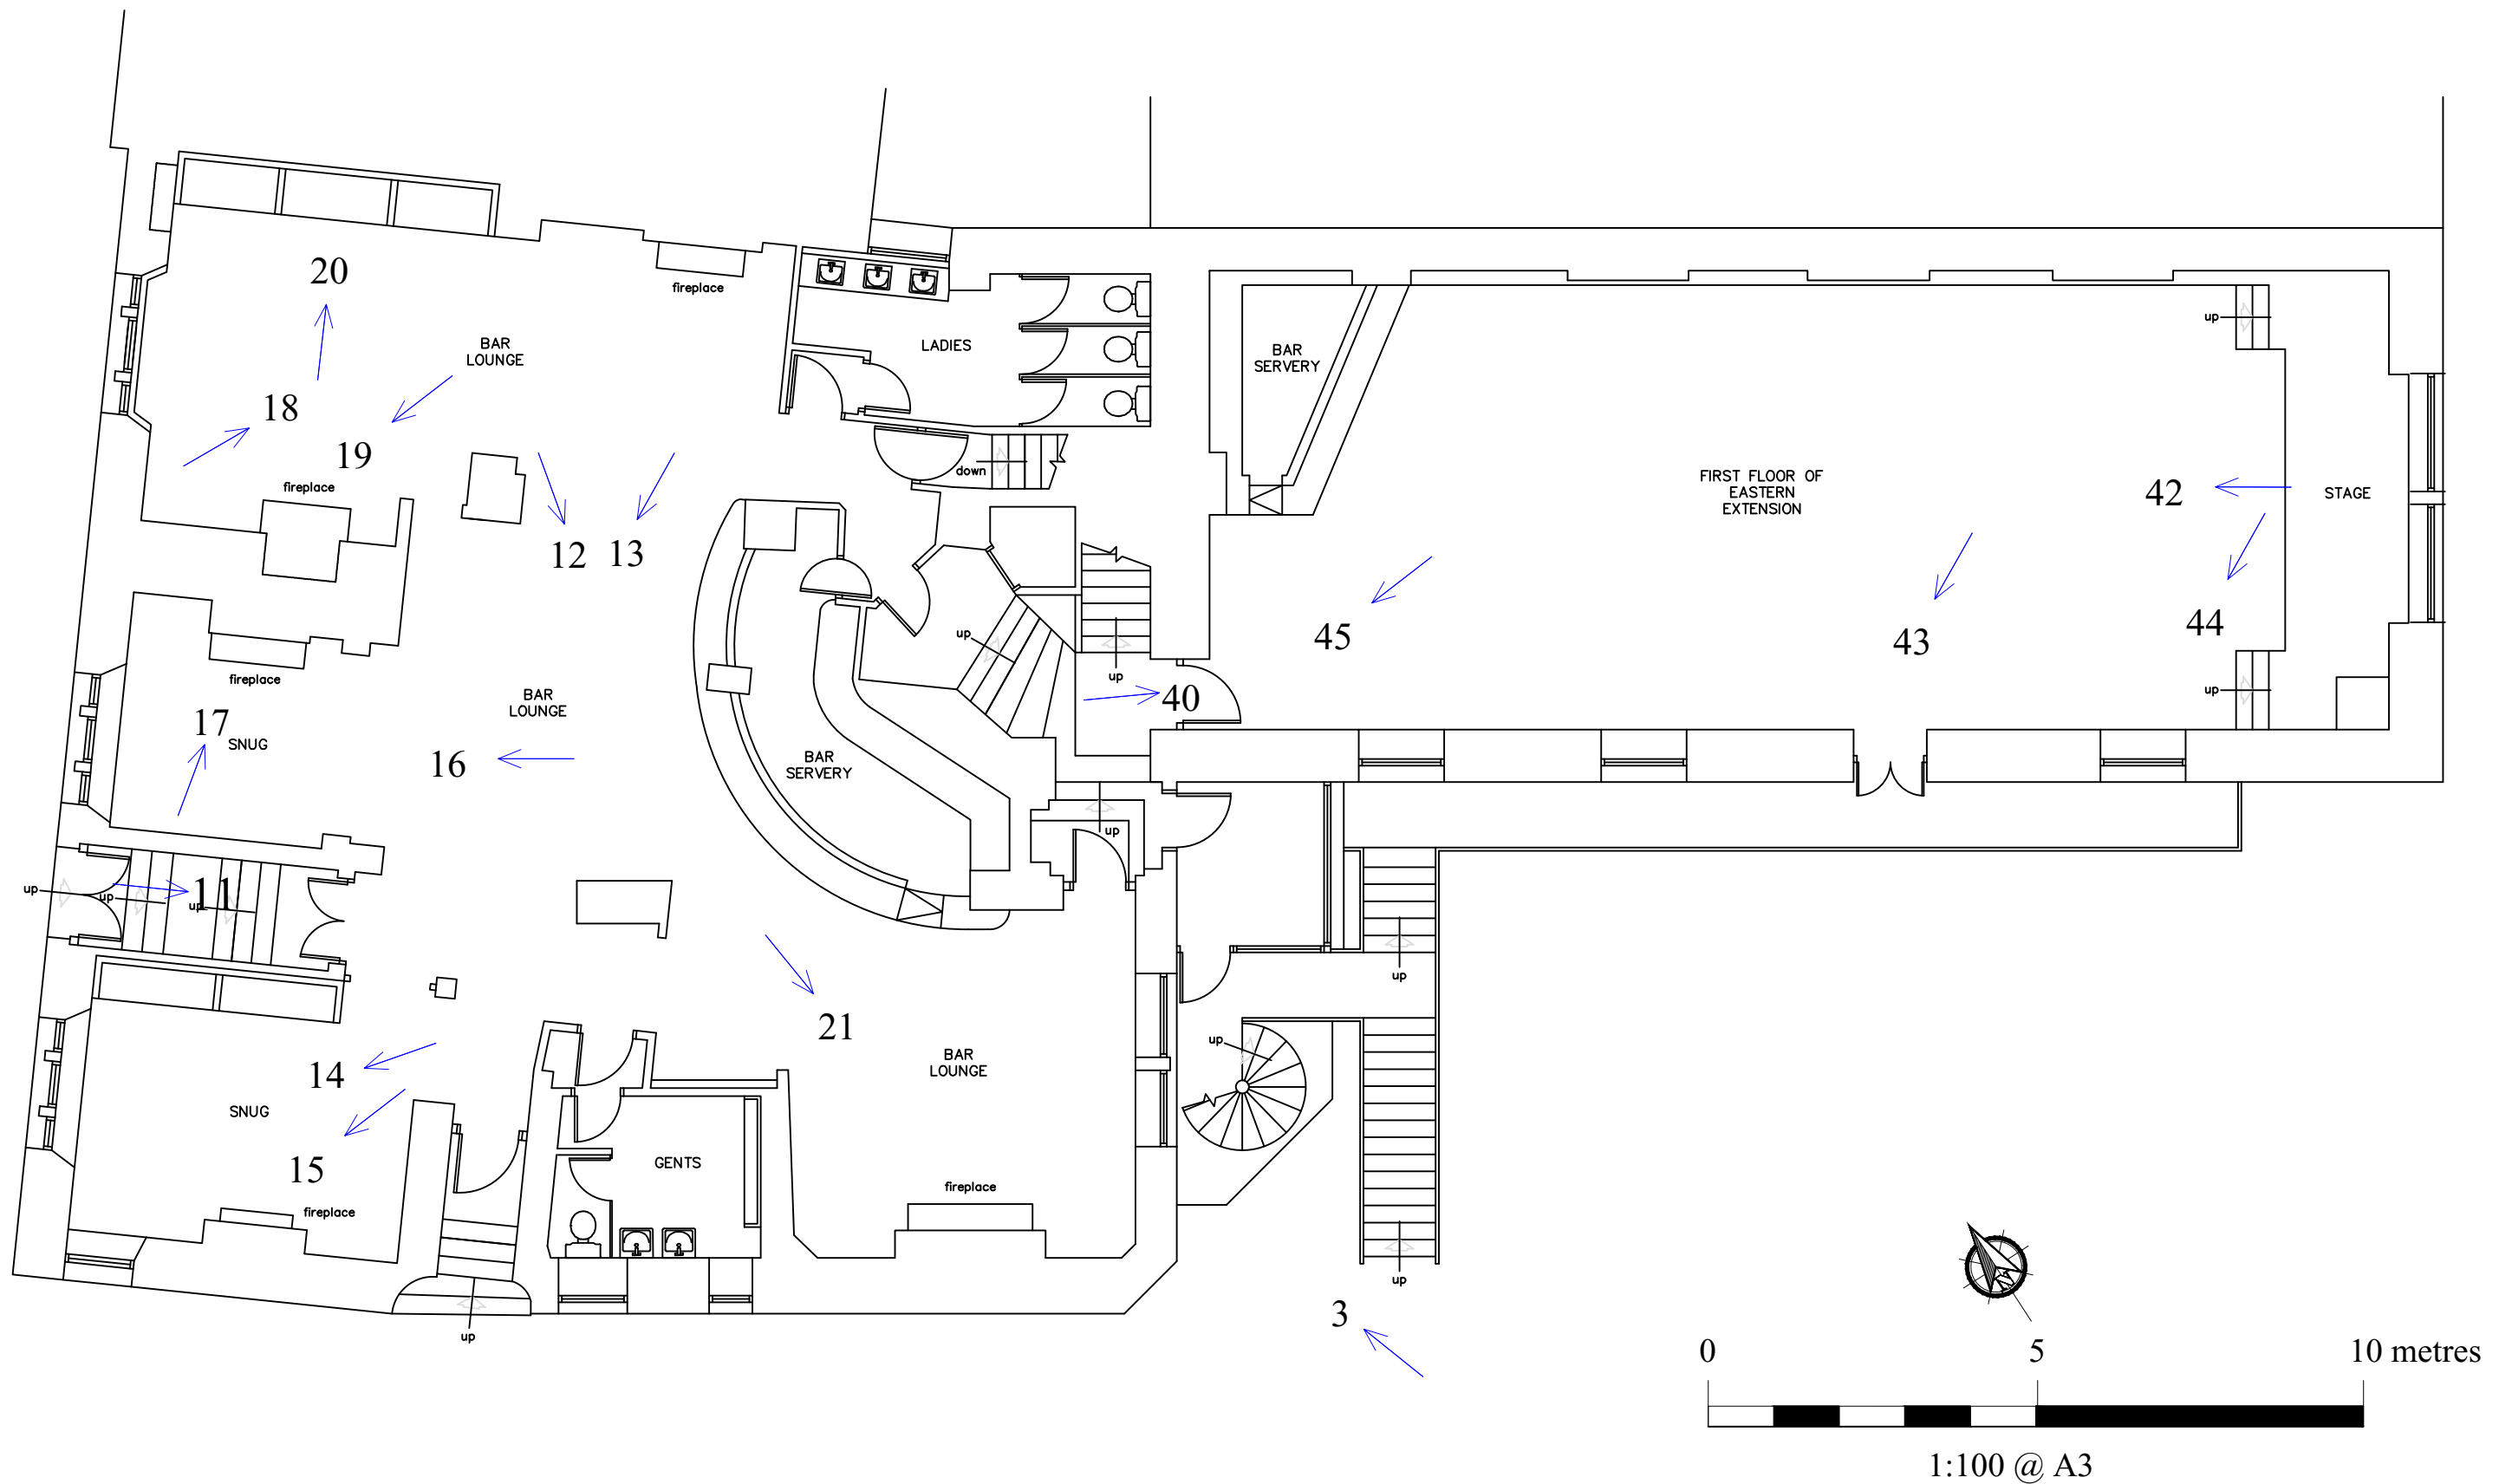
Photograph Location -Raised Ground Floor of Inn and First Floor of Eastern Extension
